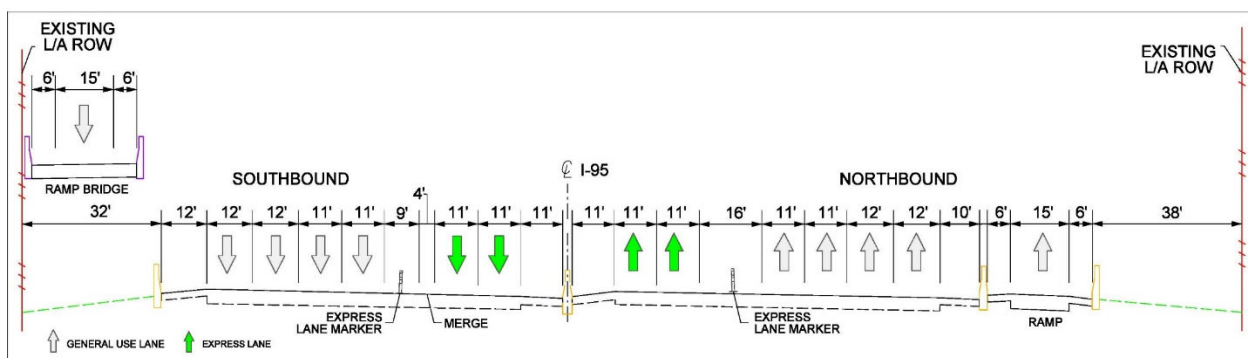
Alternative 1 Roadway Section North of Pembroke Road
